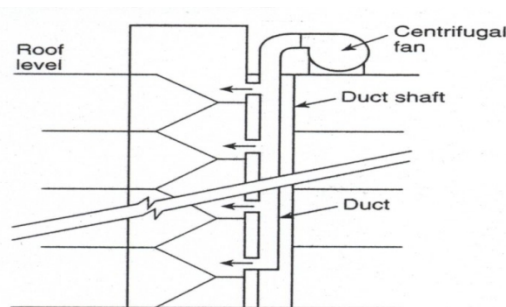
Stairwell Pressurization by Multiple Injection with Roof Mounted Fan, (Klote and Milke, 2002).
